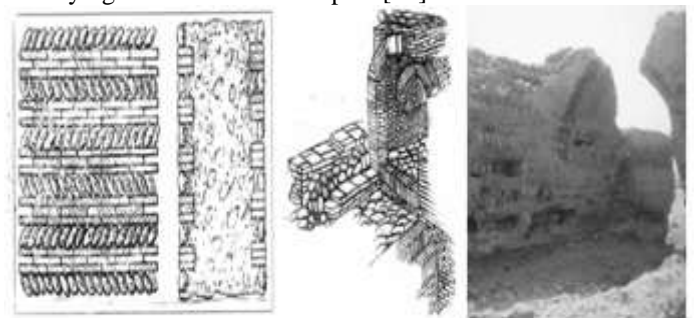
The details of Dezful watermills; the view and a profile of the Sasanid Bridge structure in Dezful, which was used in constructing the watermills walls [21]
